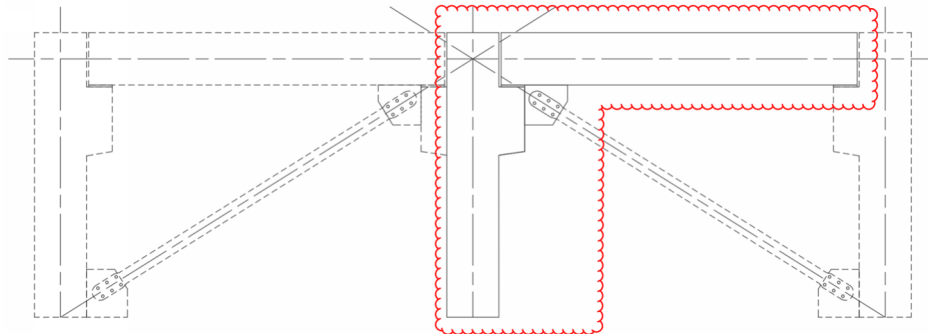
Beam, column, and gusset plate tested with respect to full frame
